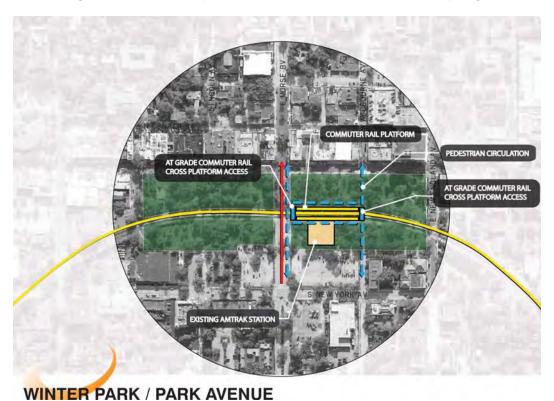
Conceptual Station Site Plan – Winter Park/Park Avenue
